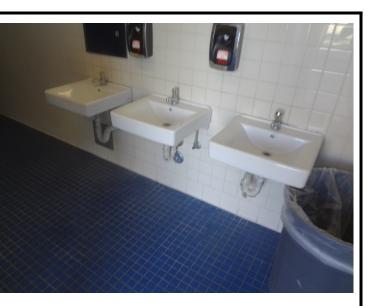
Typical Boys and Girls Bathroom: Bathrooms in good condition with updated accessible fixtures
